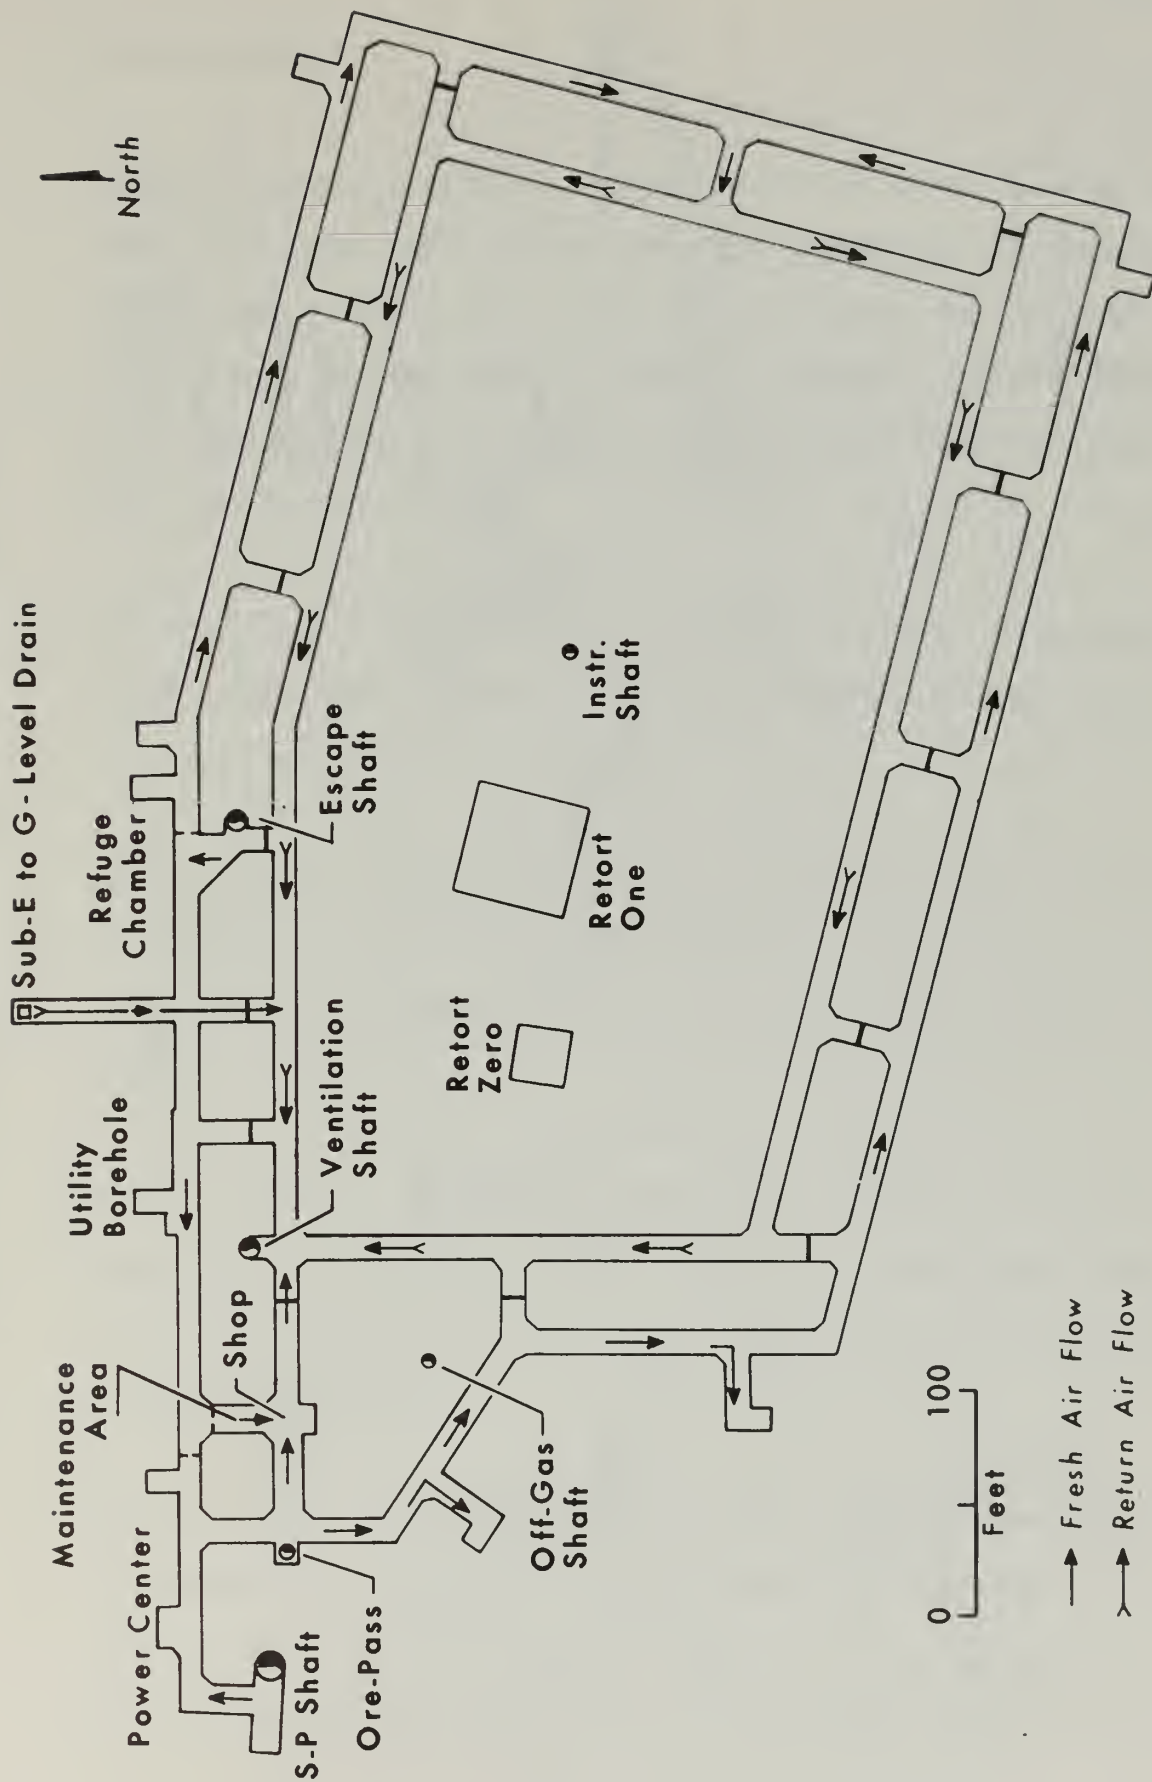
Sub 'E' Level Design and Ventilation Plan During Retort '1' Burn
